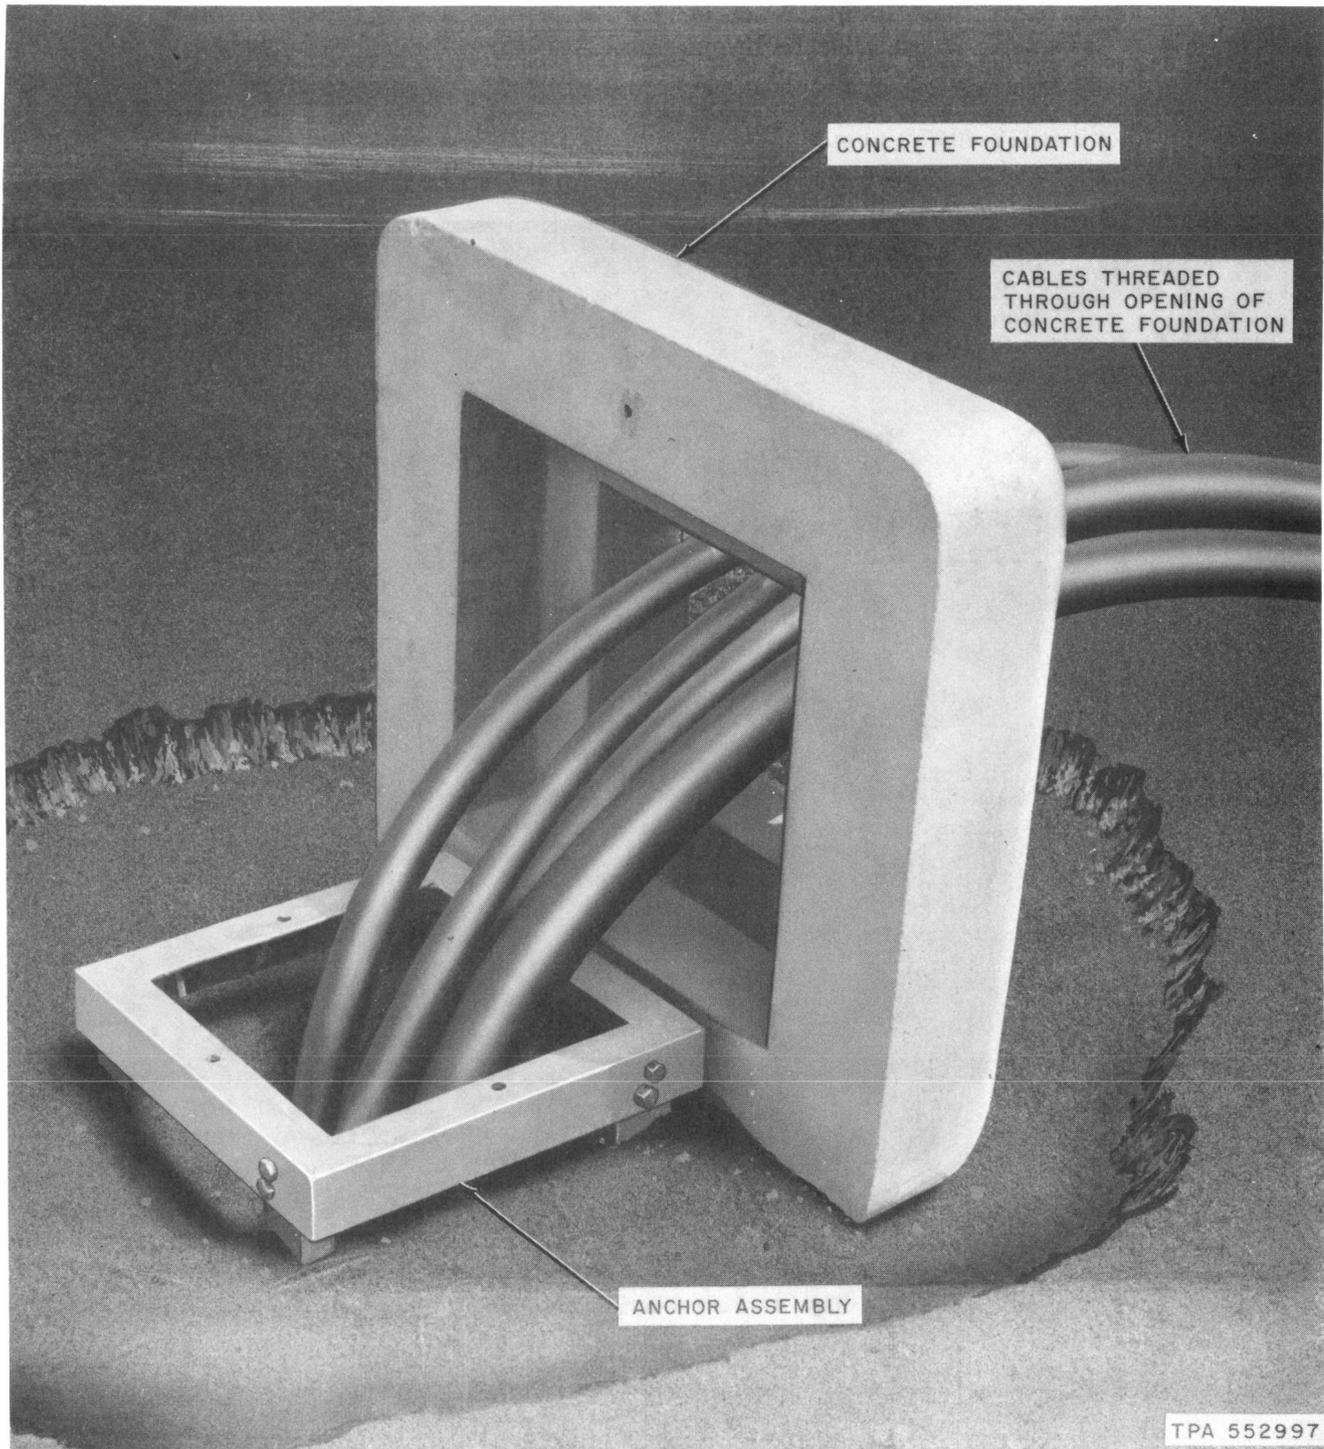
Cables Threaded Through Opening in Concrete Foundation
